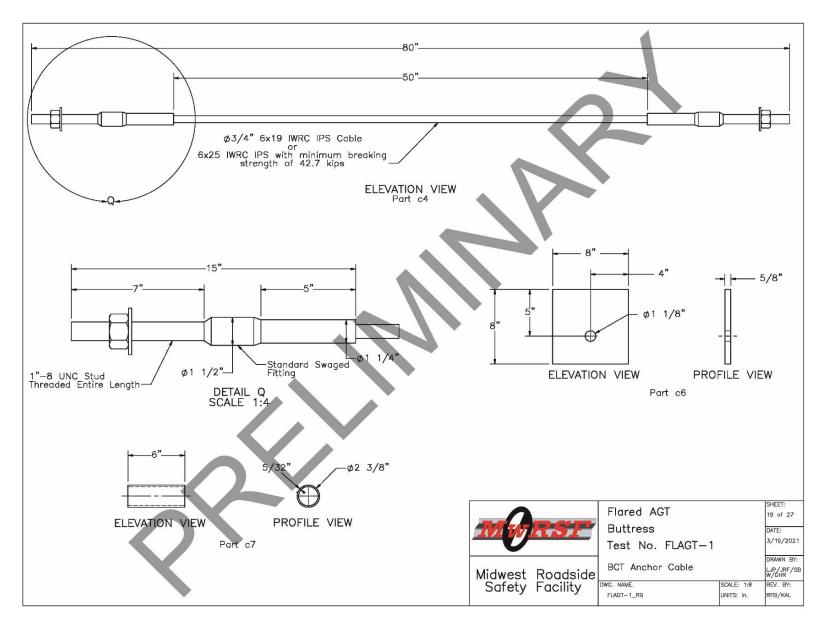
BCT Anchor Cable, Test No. FLAGT-1
